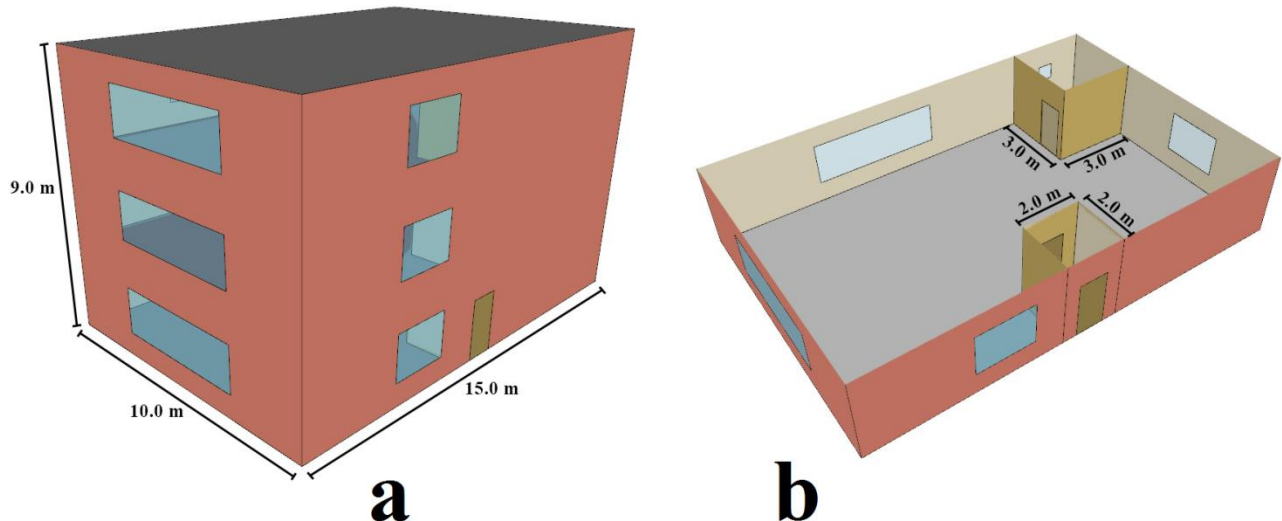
Overall outlook of considered building; a - geometry and dimensions of the building; b - plan of one floor (all floors are assumed to be the same). Eastern facade of the building is assumed as the facade where exterior door is placed. Presented views were made as 3D models in *Google SketchUp*⁶⁹ [9]
